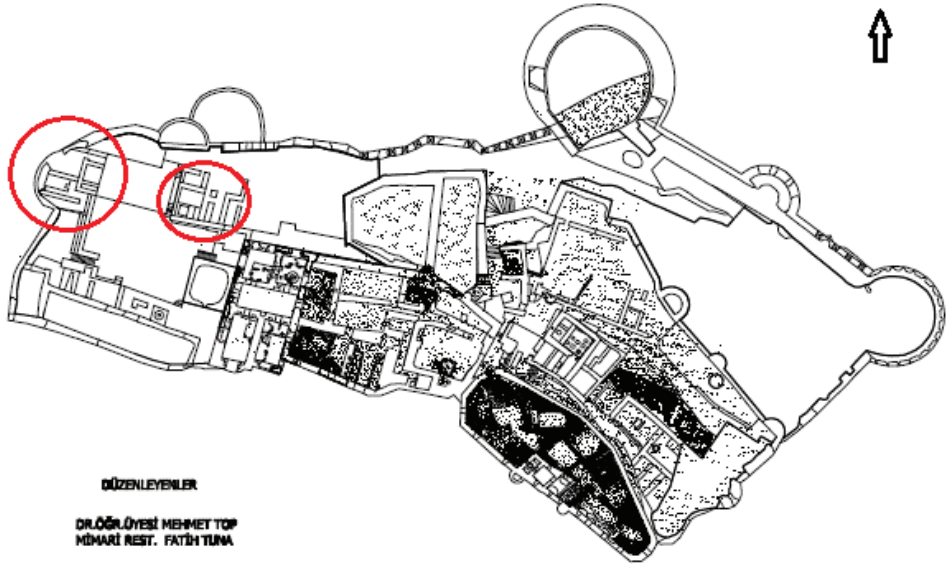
Plan of the Hoşap Castle. Stucco fragments found in marked areas (Excavation archive)
